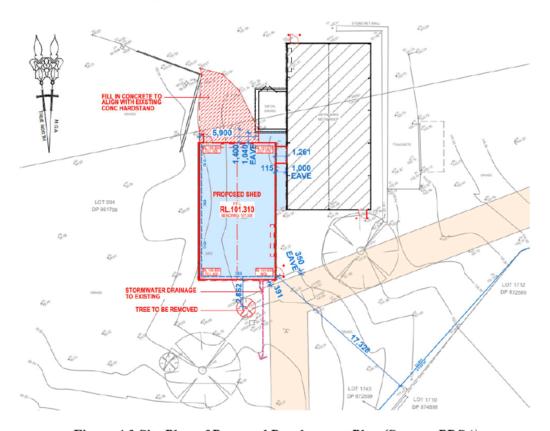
Site Plan of Proposed Development Plan (Source: PDSA)
